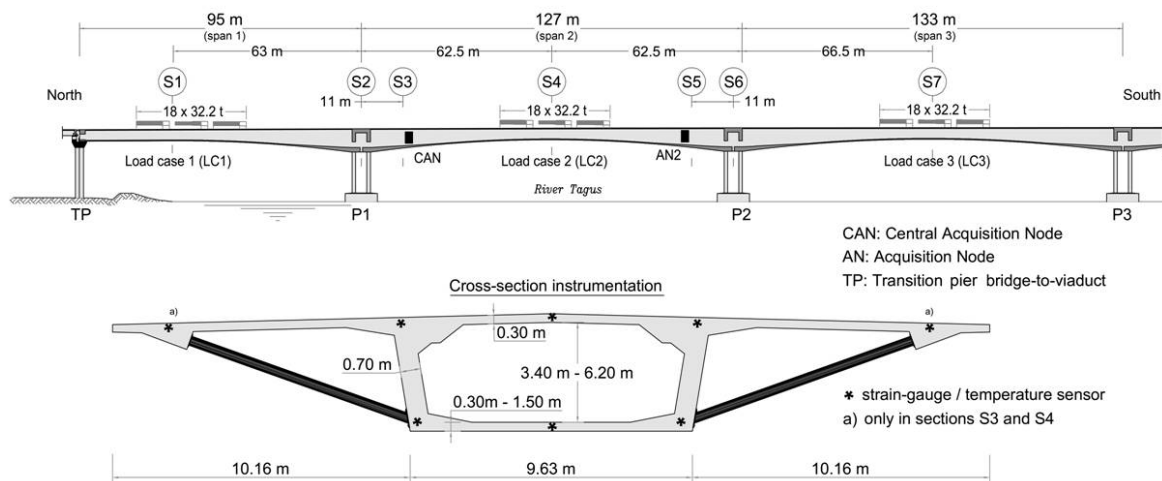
Location of the instrumented cross-sections in Lezíria Bridge
